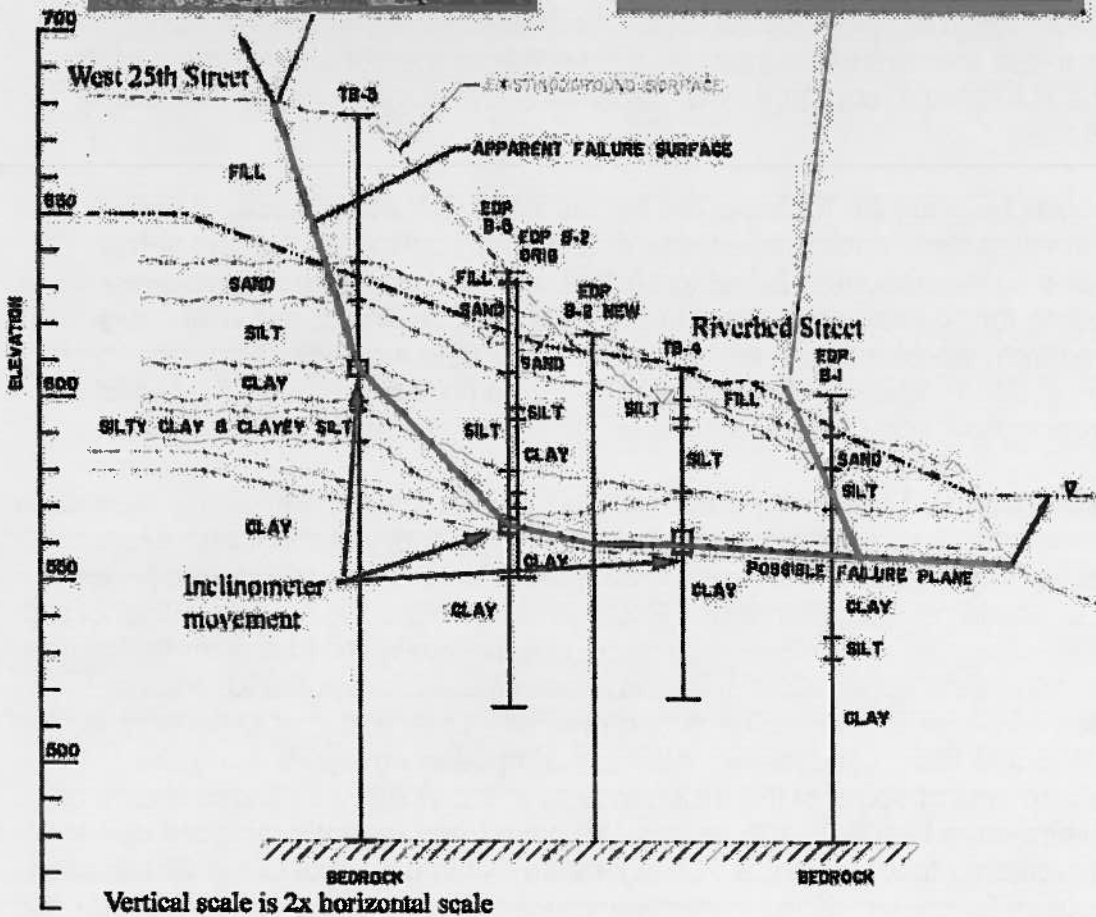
Idealized cross section of slope adjacent to West 25th St., near downtown Cleveland (slope is down to the left in the pictures instead of down to the right in the cross section).
